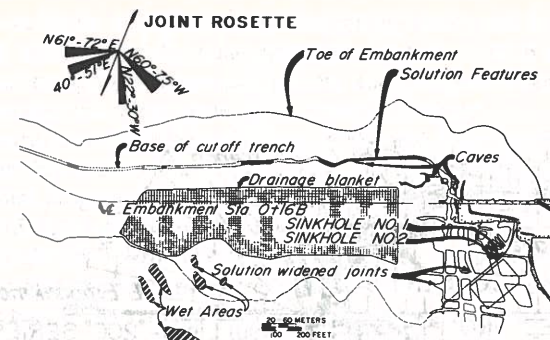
Plan of Features in Embankment Foundation and Wet Areas
